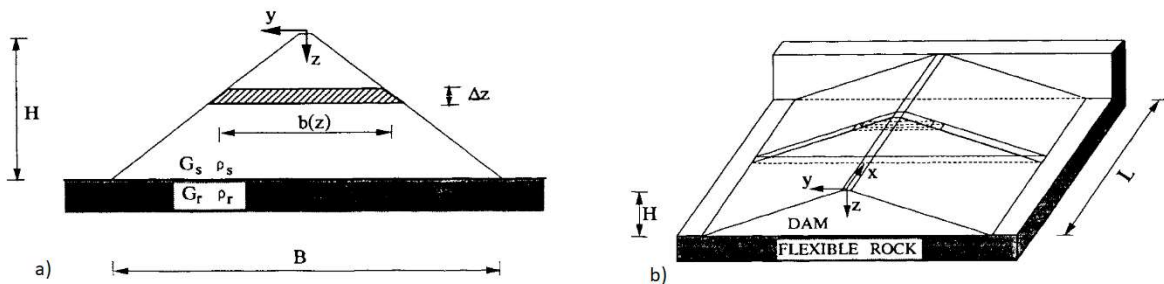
a) Dam Cross-Section; b) Perspective View of Dam Geometry [56]
